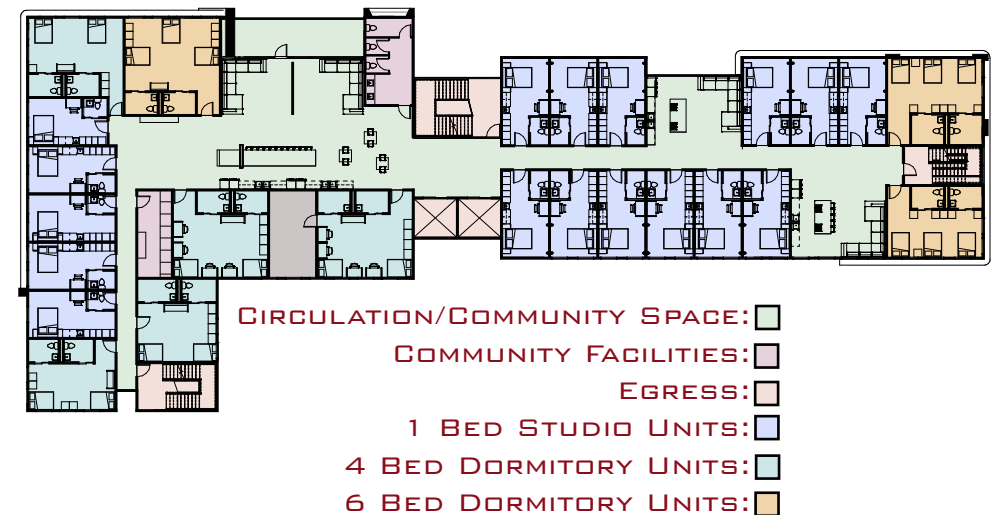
| LEVEL 7 CO LIVING PLAN | DJV
